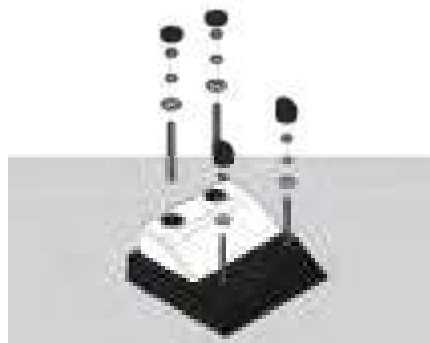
Install the anchors. To ensure that the threaded rod is correctly anchored, it should be rotated while being inserted into the hole (full of resin) so that it is covered completely with resin. Once the resin is dry, tighten the nuts with the socket wrench.
